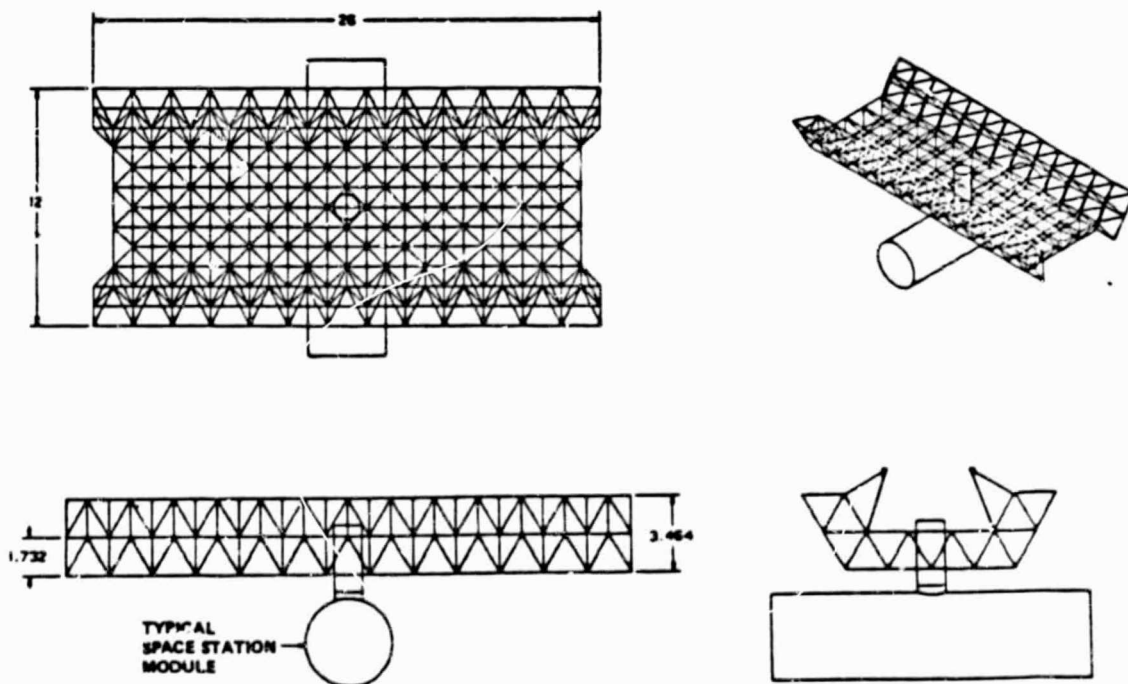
TDM Configuration LSS-1, Construction and Storage Facility
